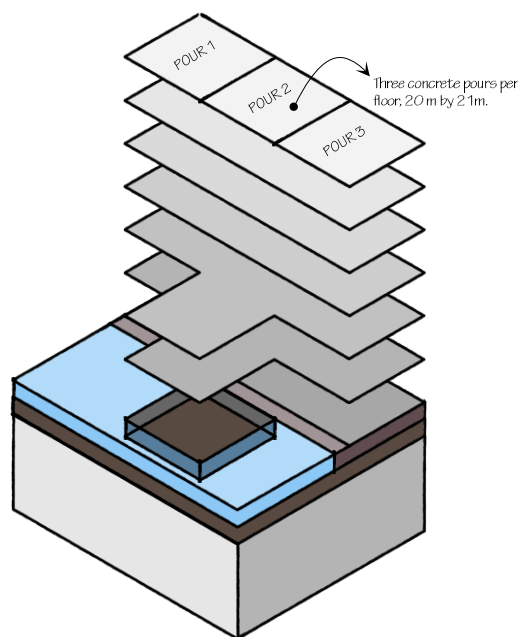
Location of concrete pours. In the dry dock, horizontal bracing props are required to support the sheet piles.
